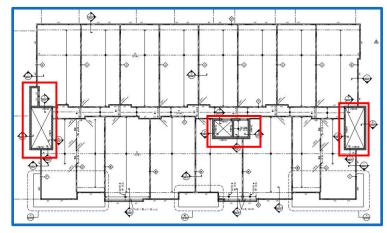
Apartment Level Floor Plan, Masonry Shaft Callout (KSS)
